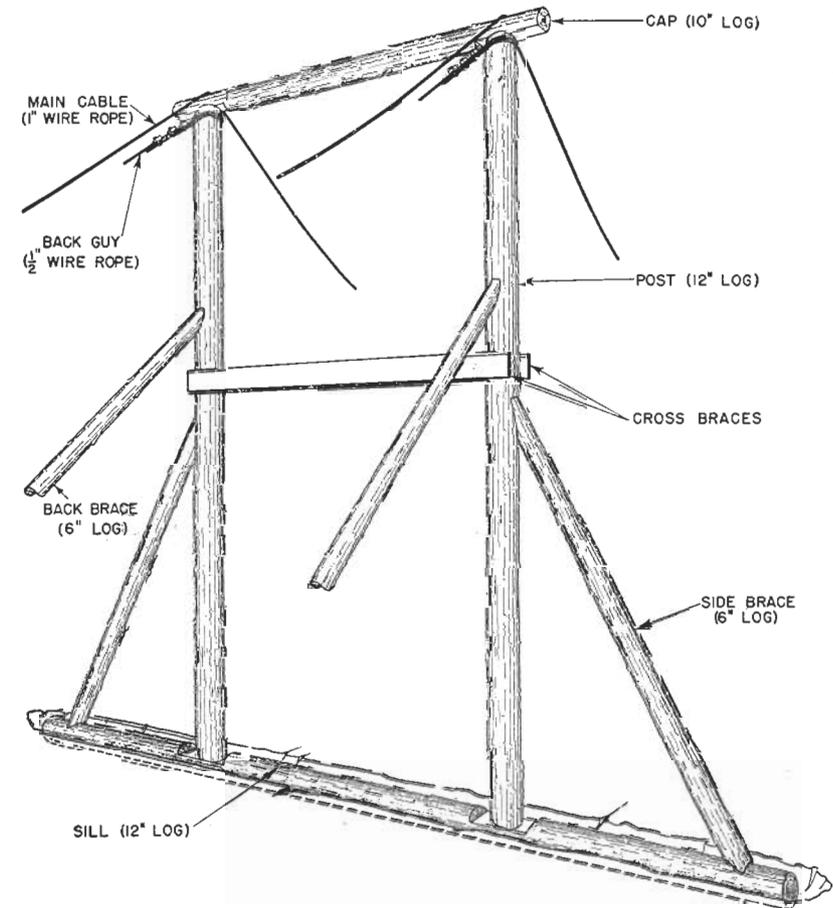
Improvised tower, type-2, for light-equipment suspension bridge. Used for long spans when dimension lumber is not available.
